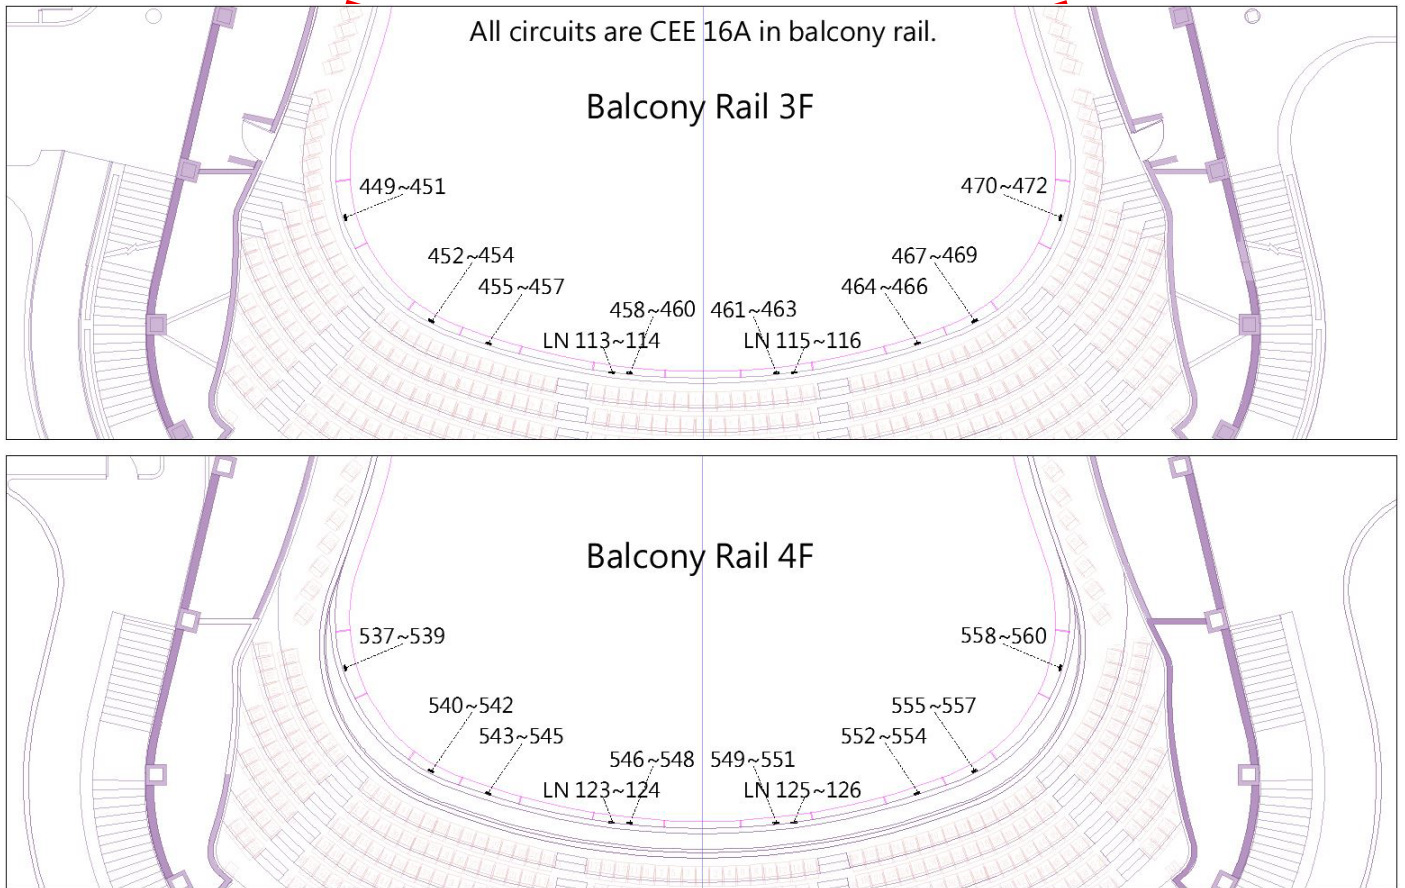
Balcony Rail Lighting Circuit Layout
